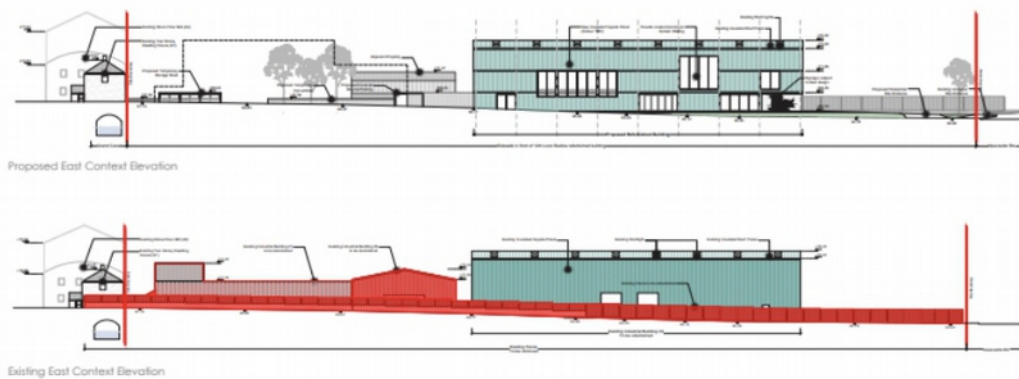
Existing and proposed east elevations. Existing site buildings hatched in red to be removed. Source: Stephen Foley Architects
